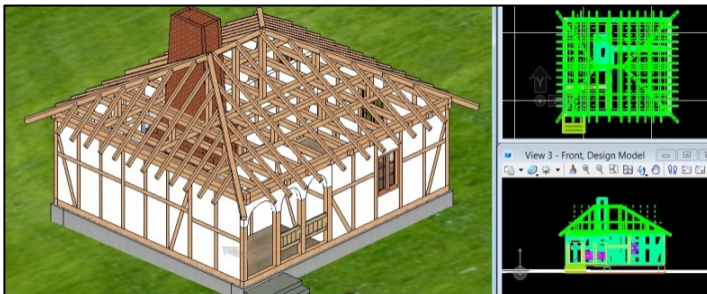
AECOSim Building Designer house model with displayed roof and envelope structure
